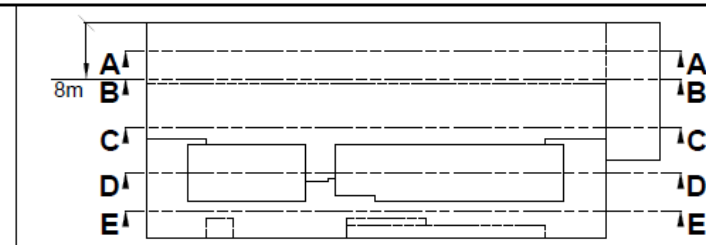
Section view of tritium plant building at 8 m from the TKB.
